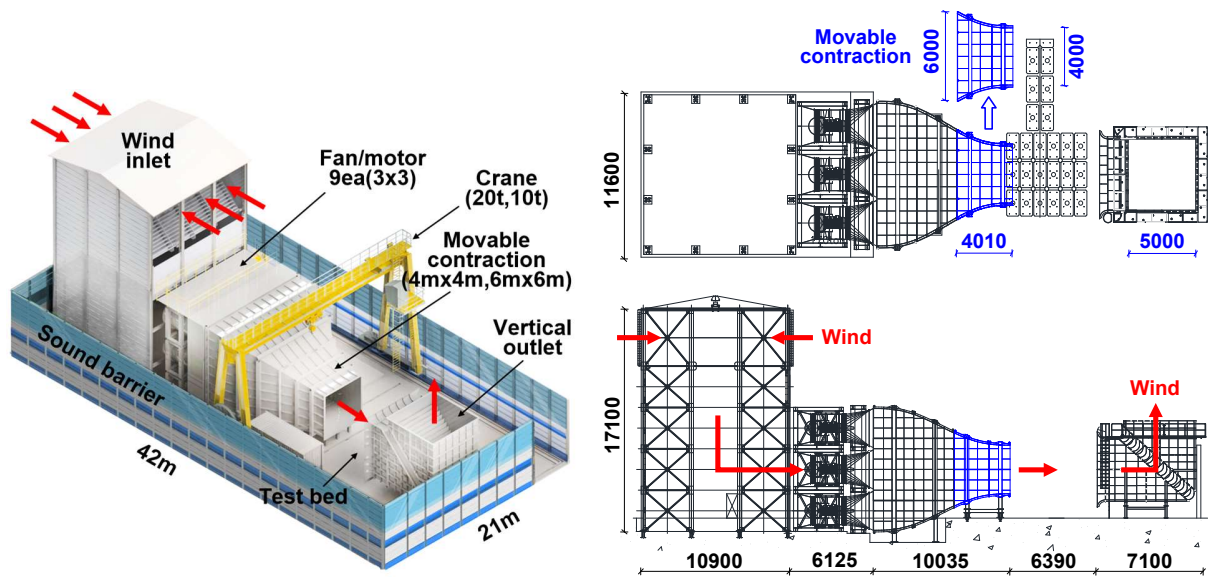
Perspective, plan, and front view of the KOCED outdoor wind tunnel.
